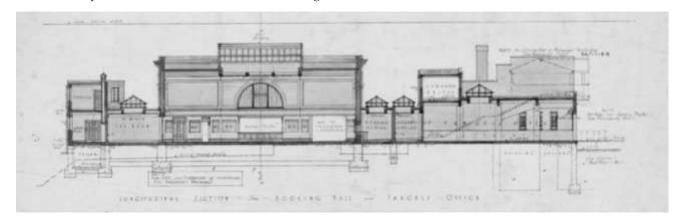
A detail from the drawings for the rebuilt Hastings station giving the longitudinal section through the booking hall and parcels office. The grandeur of the top-lit booking hall is obvious. (*Courtesy of Network Rail Corporate Archive*)
